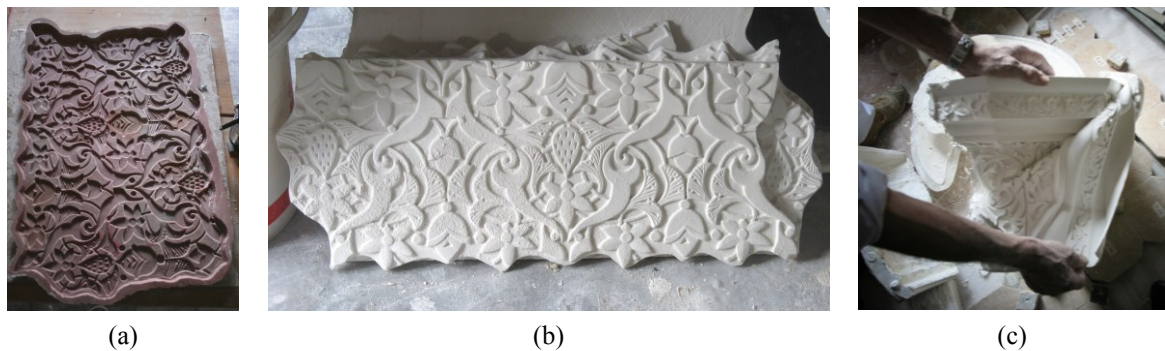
Reproduction of damaged elements in *Monserrate* Palace: (a) mould of a panel; (b) several pieces made from the mould shown in (a); (c) capital being demoulded
